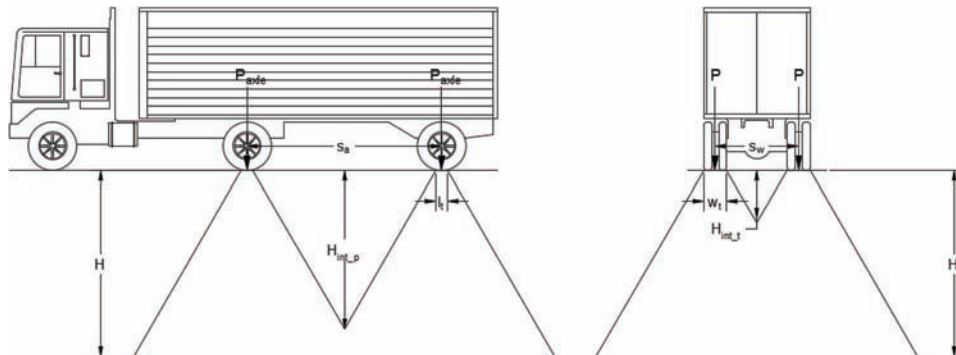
Longitudinal and transverse view of HL-93 design truck, one lane loaded.
